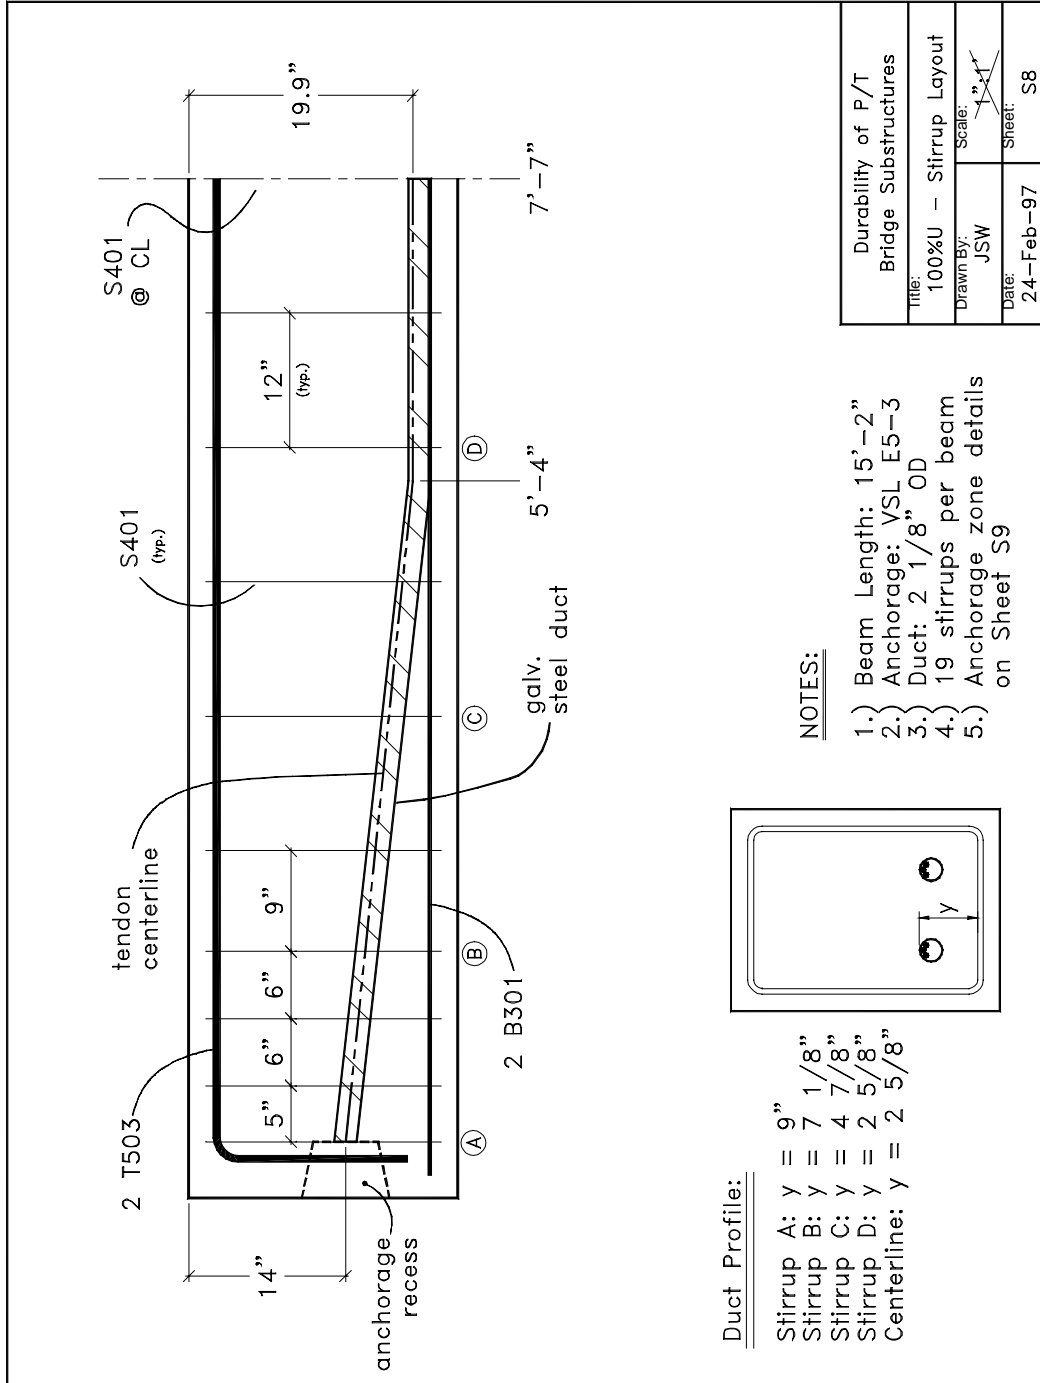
Sheet S8: 100%U Stirrup Layout
